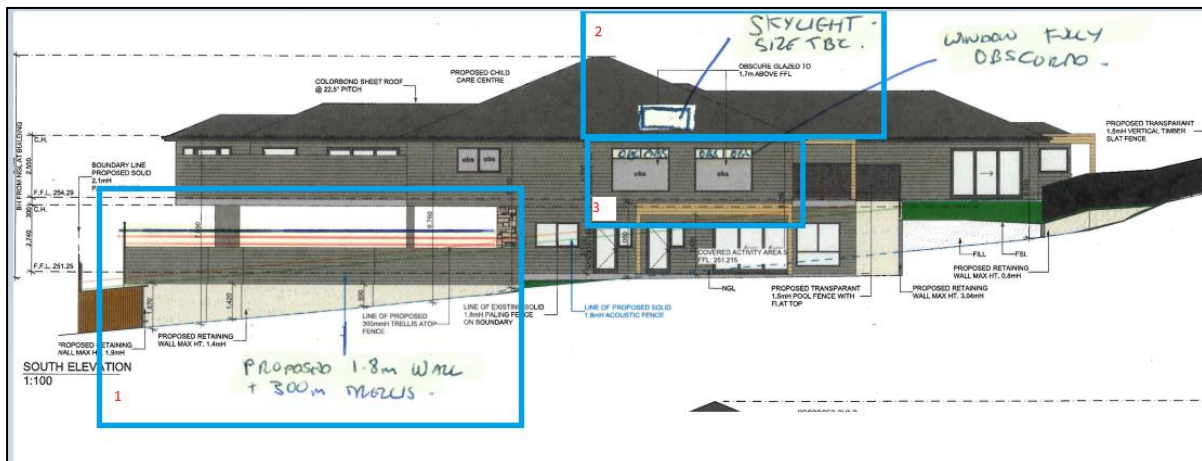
Negotiated changes between the applicant and adjoining owner (southern elevation)
